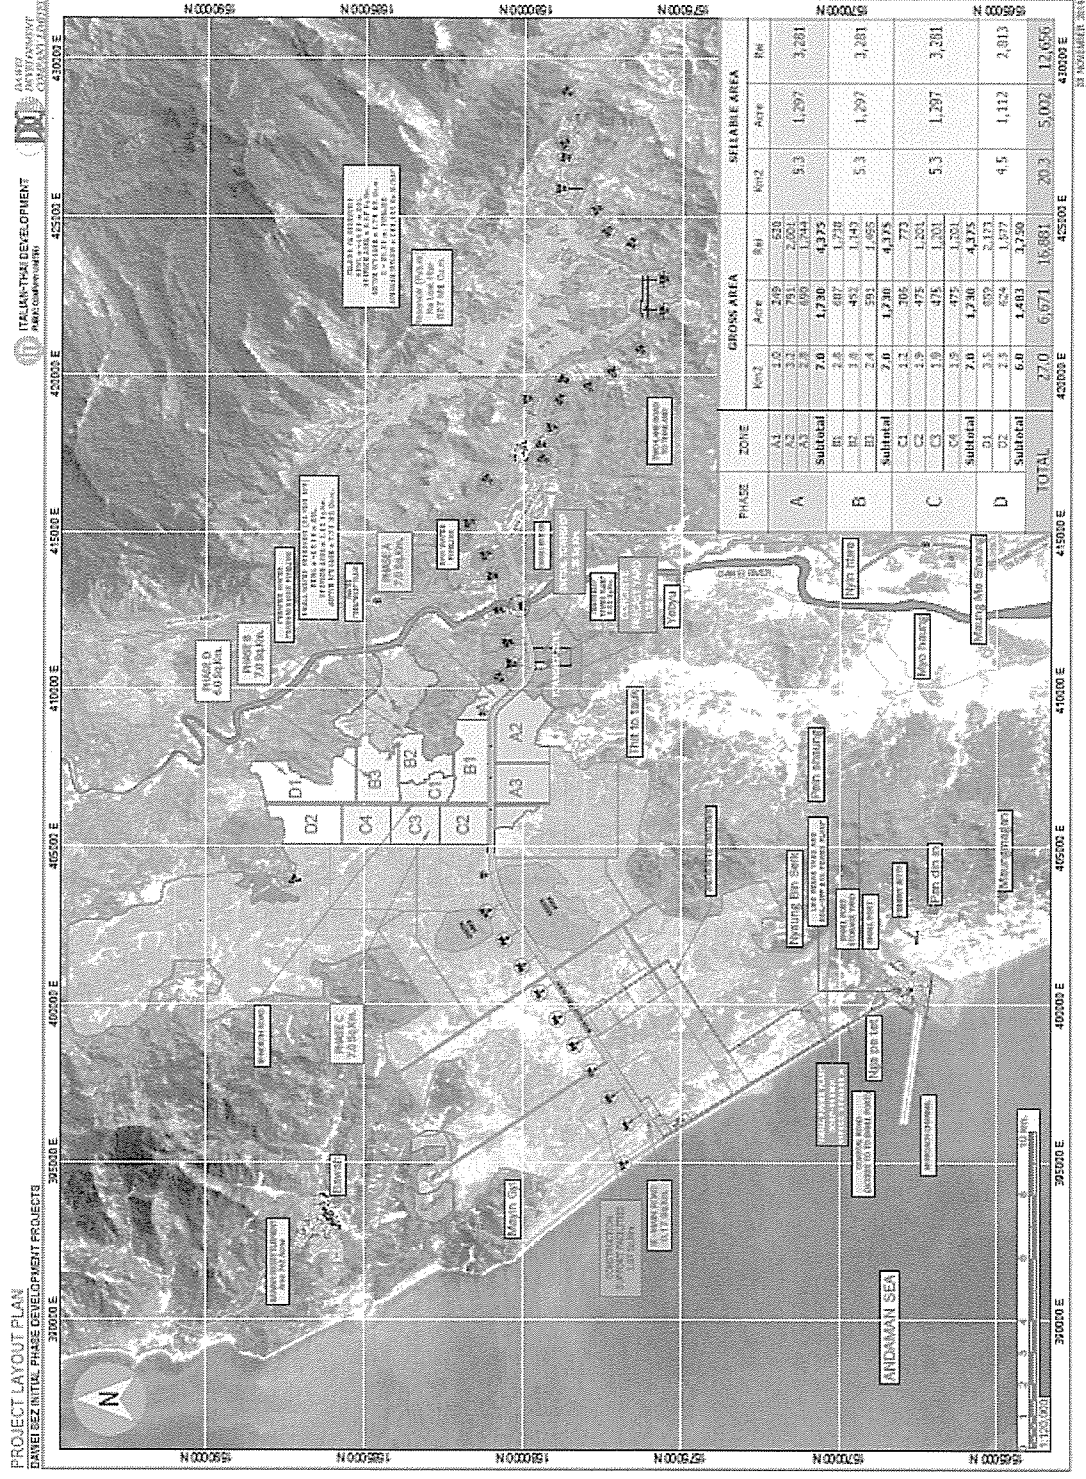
OVERALL LAYOUT AND INDUSTRIAL ESTATE ZONING PLAN
